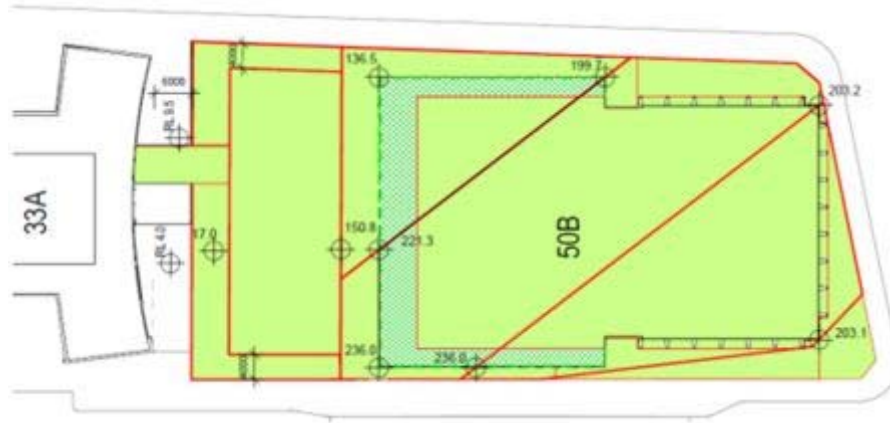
Stage 1 building massing plan (50 Bridge Street) – shaded area = 10% additional design excellence bonus floor space
